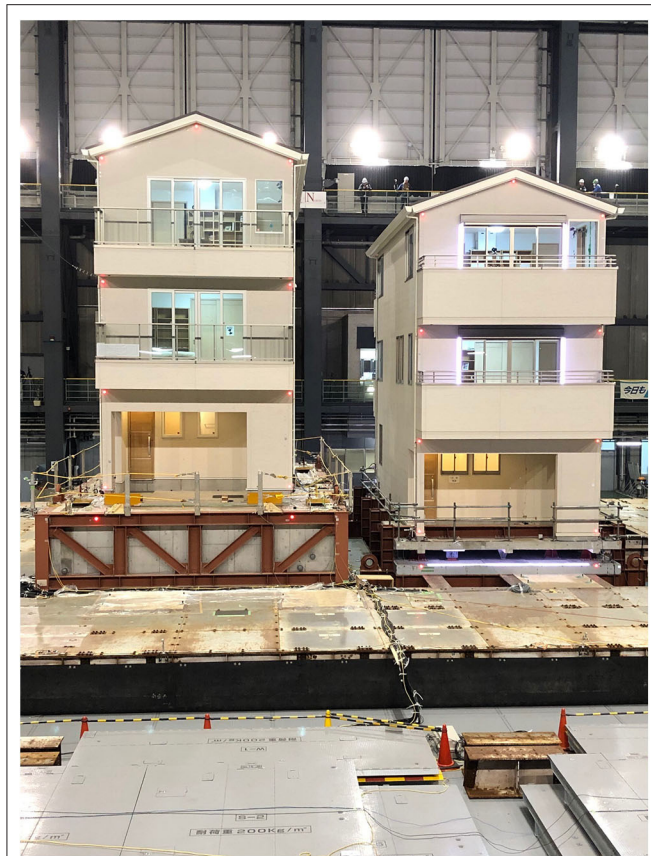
| Full-scale test of two wooden houses at E-Defense.
